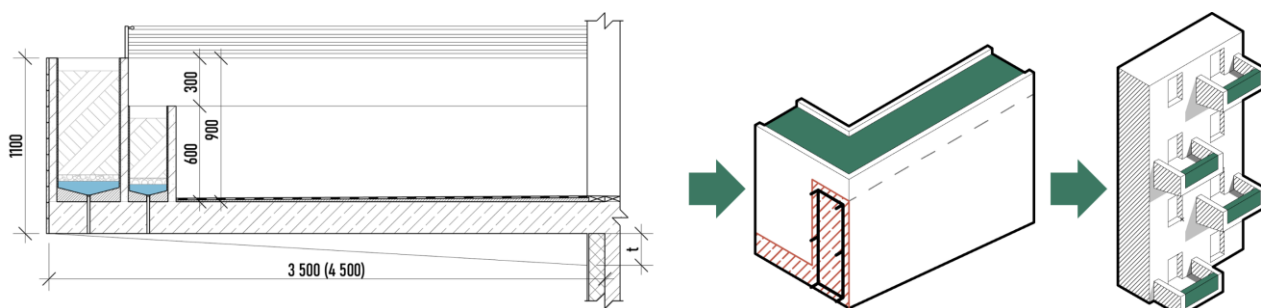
Cantilever construction of agricultural element with struts [author's development]
